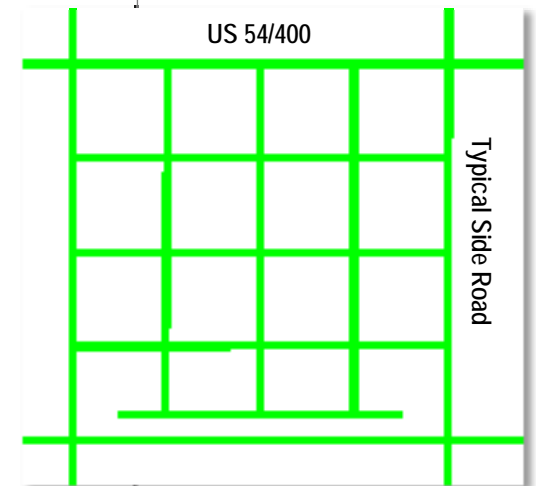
Conceptual roadway layout - typical one-mile section.
